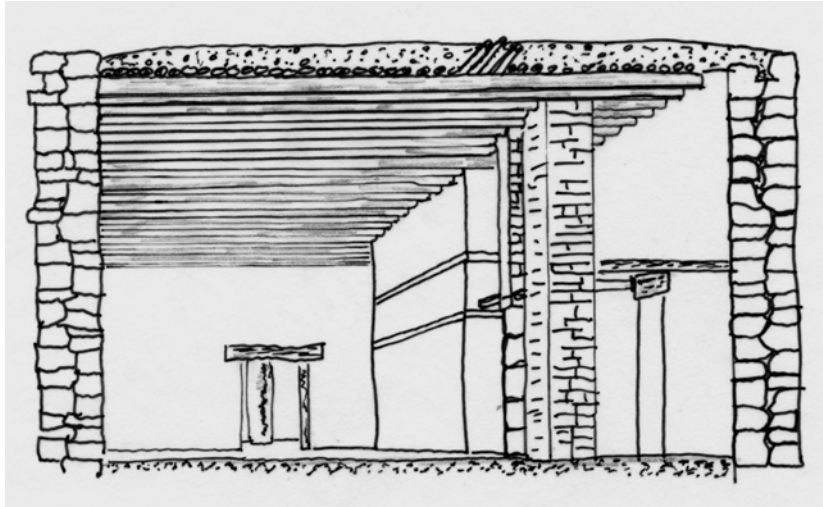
A flat beam and mortar roof at Tulum (after Lothrop 1924).
